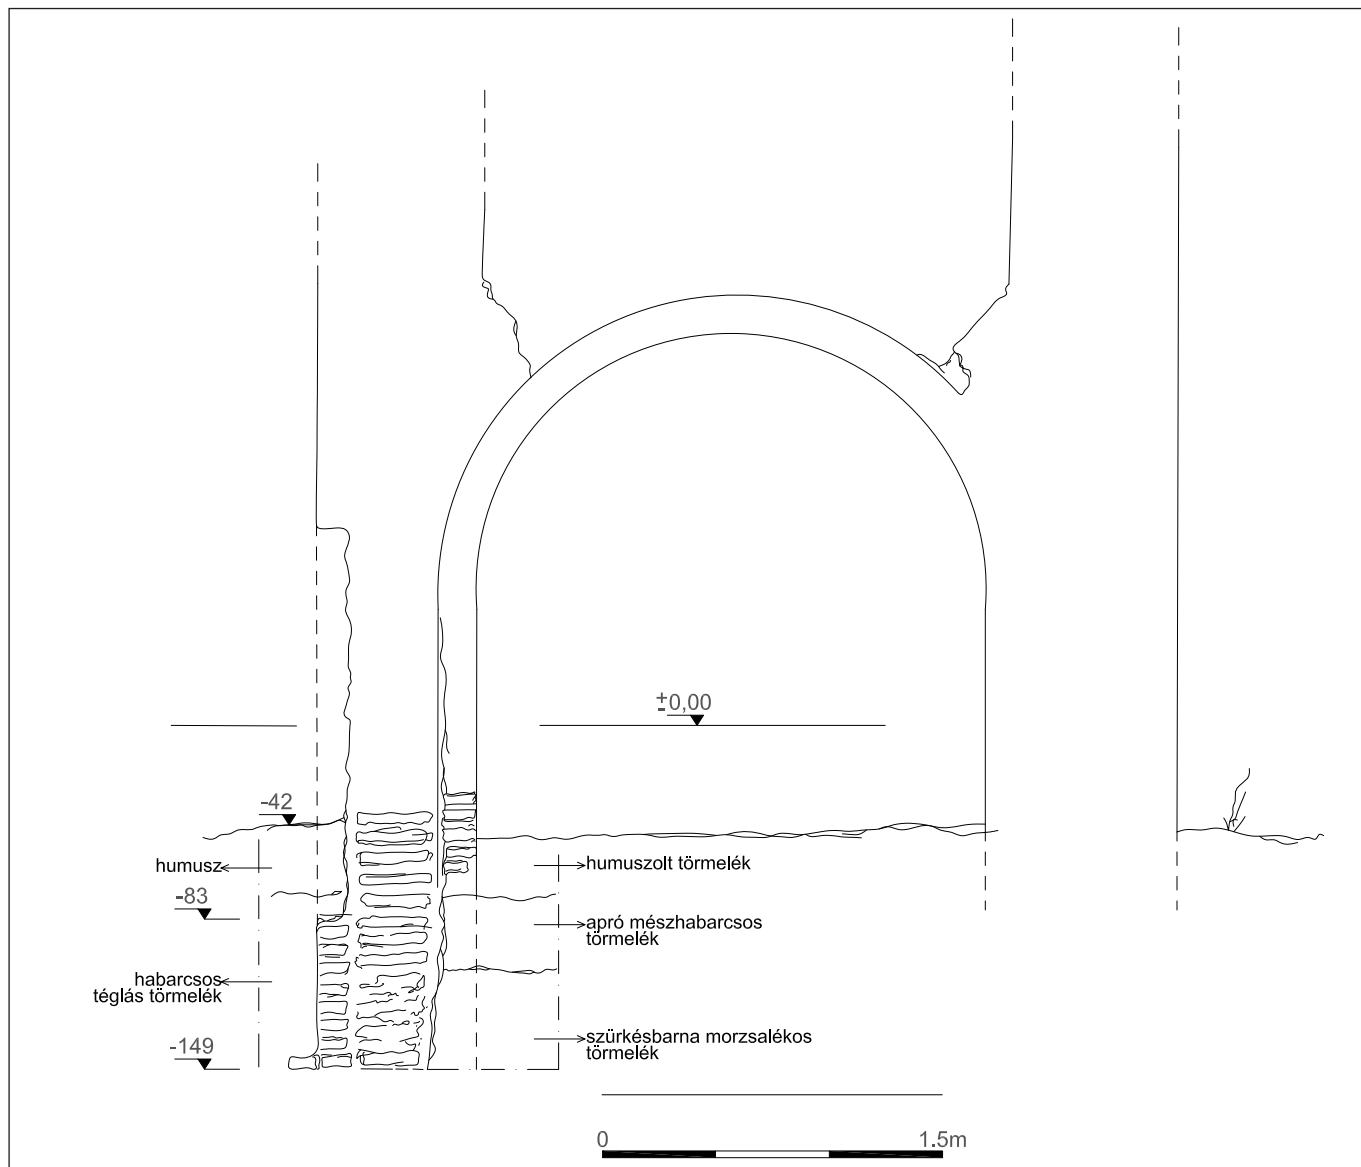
North–south wall section, including the foundation of the south-eastern wall
